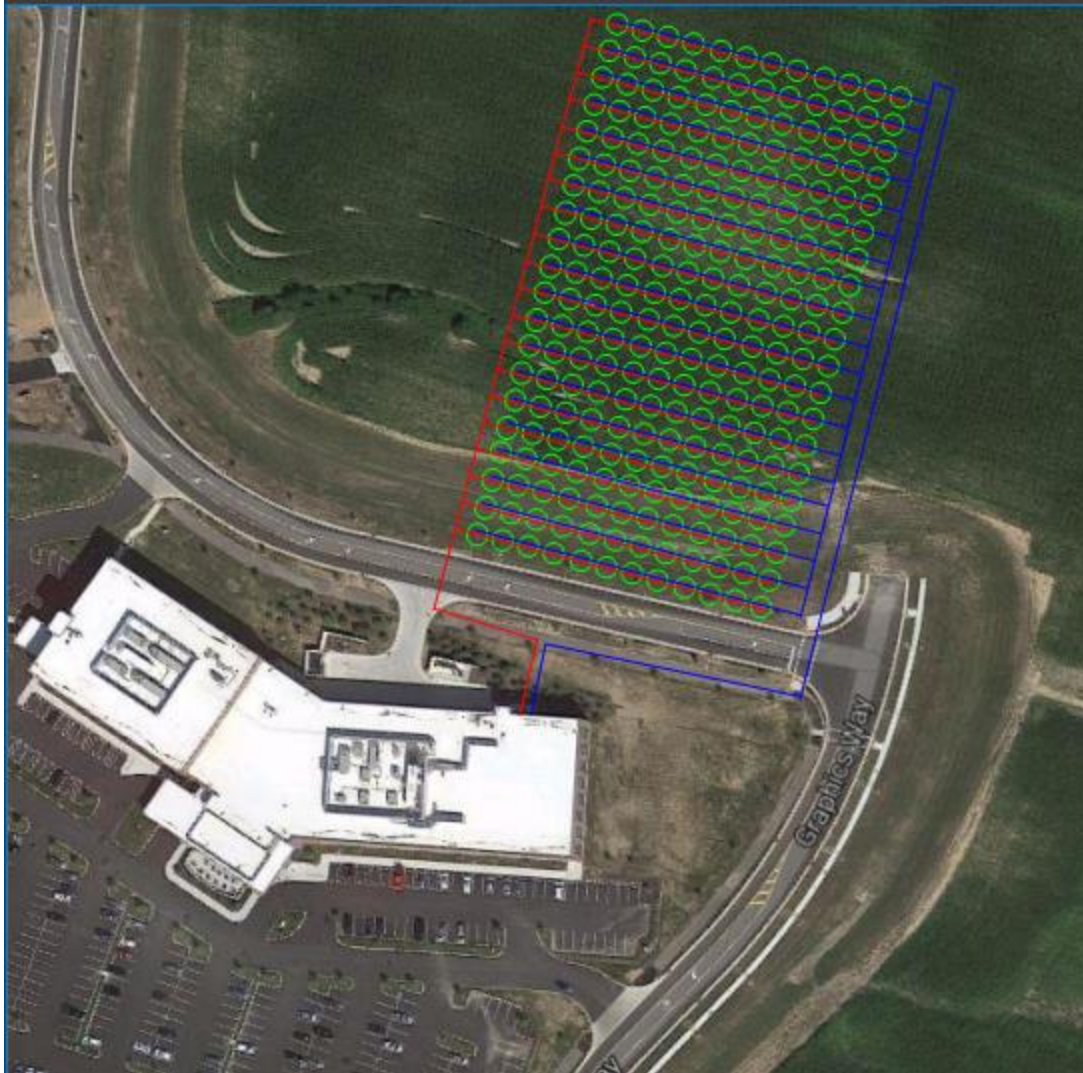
GEOTHERMAL WELL-FIELD LAYOUT
